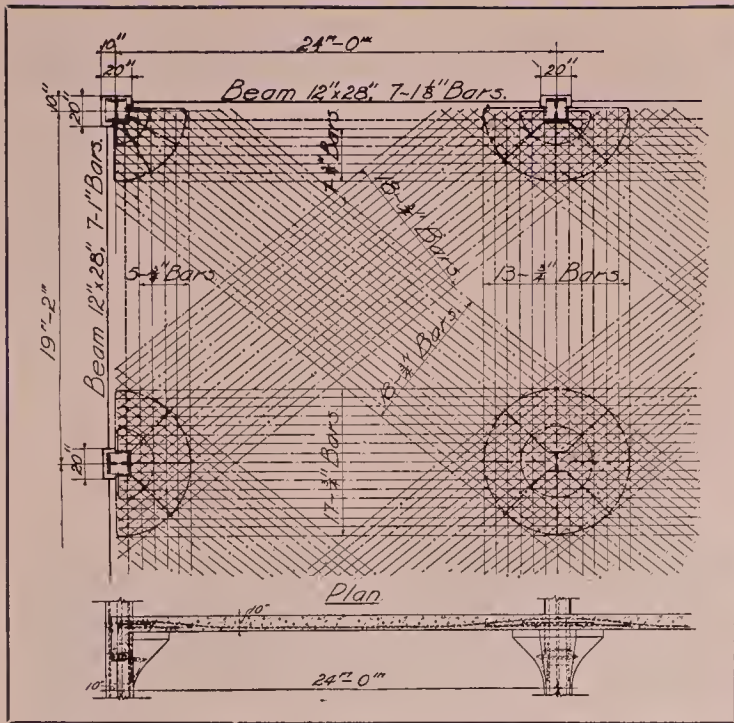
Plan Showing Floor Reinforcement, Winchester Repeating Arms Loading Building.
